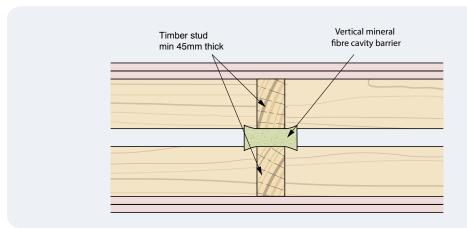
Intermediate vertical cavity barrier in double stud wall.
